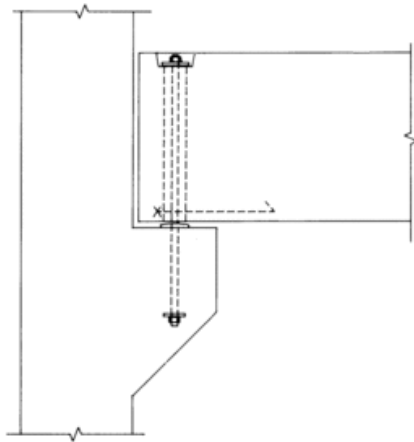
Prefabricated concrete beam and column connected with a bolt, adopted from Betongvaruindustrin (2005).
